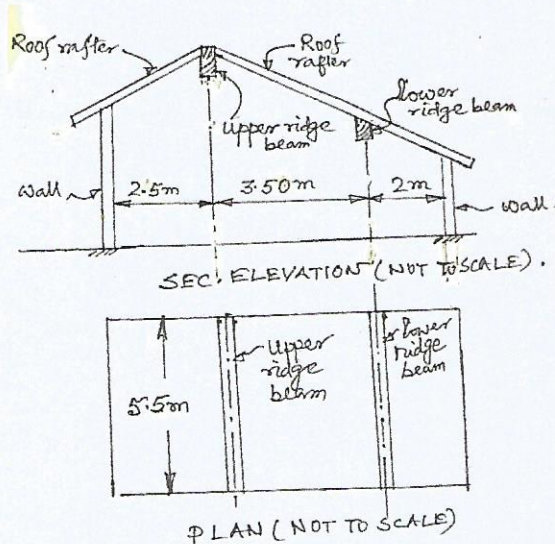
PLAN AND SEC. ELEVATION OF A BUILDING.
